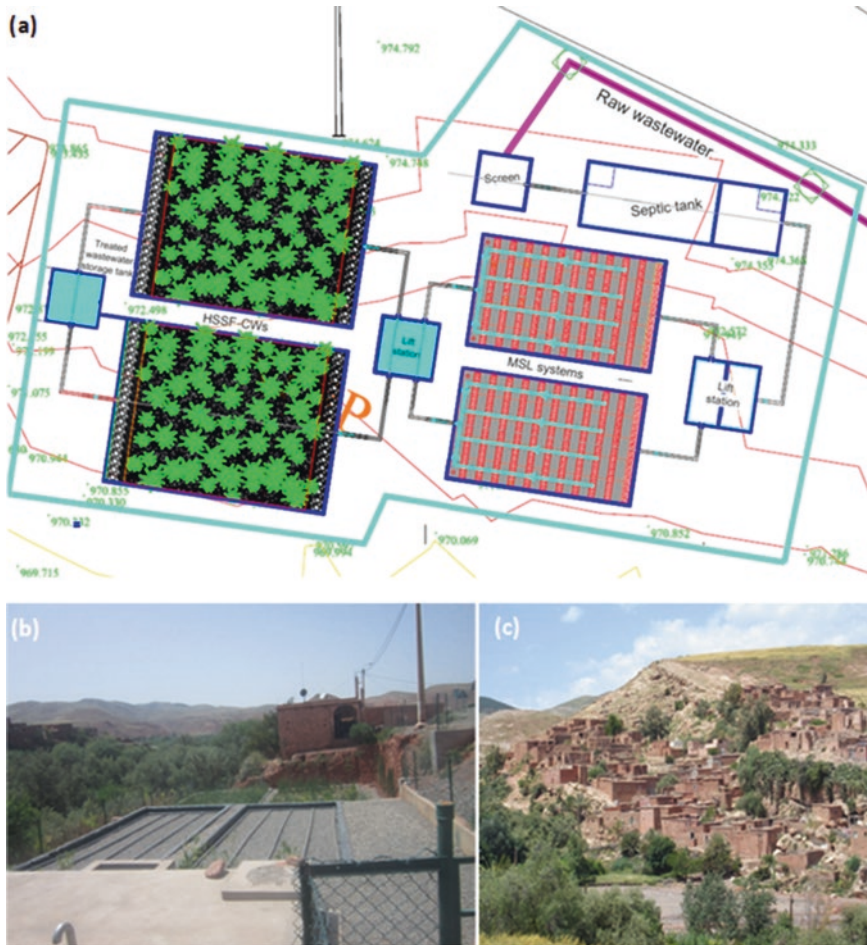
(a) Schematic layout of the Talat Marghen village wastewater treatment plant; (b) aerial view of the plant and; (c) village view
